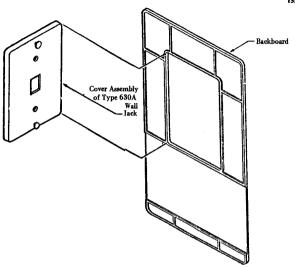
Backboard Installation Around a 630A Wall Jack
